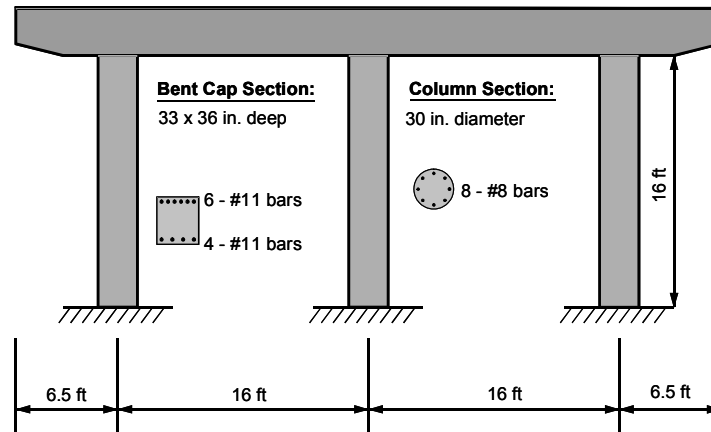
Prototype Multicolumn Substructure.^{5.1}
